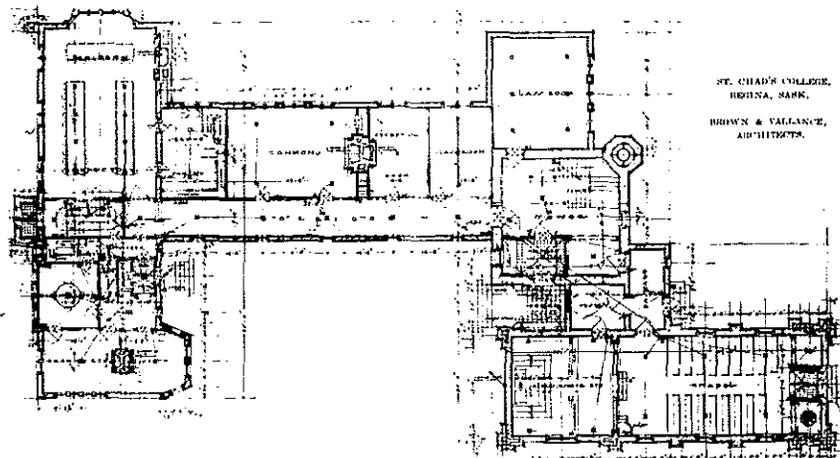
b: Plan of St. Chad's College by Brown and Vallance.
